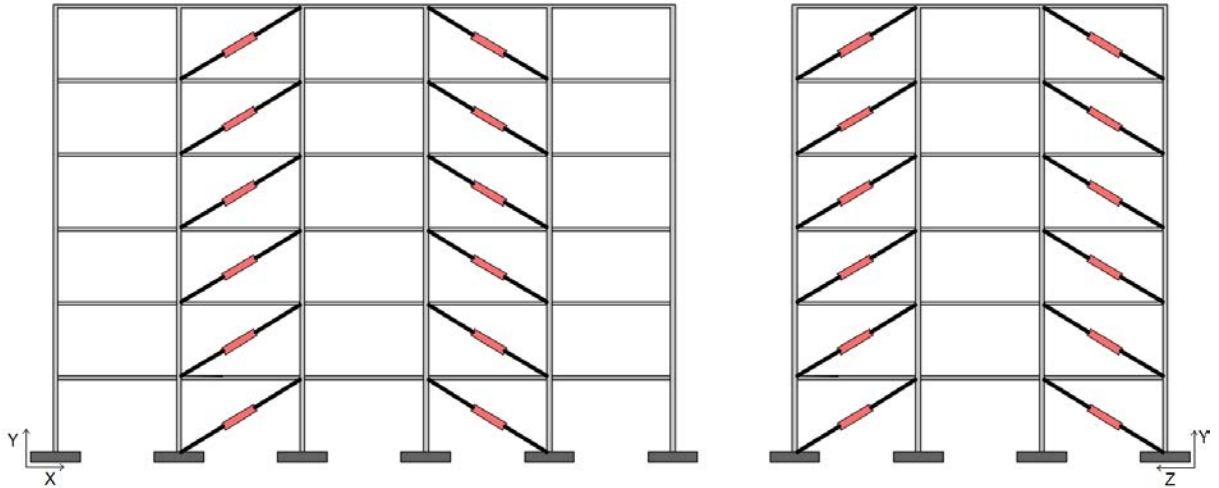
Diagonal layout of steel braces equipped with hysteretic dampers for case-study building.
